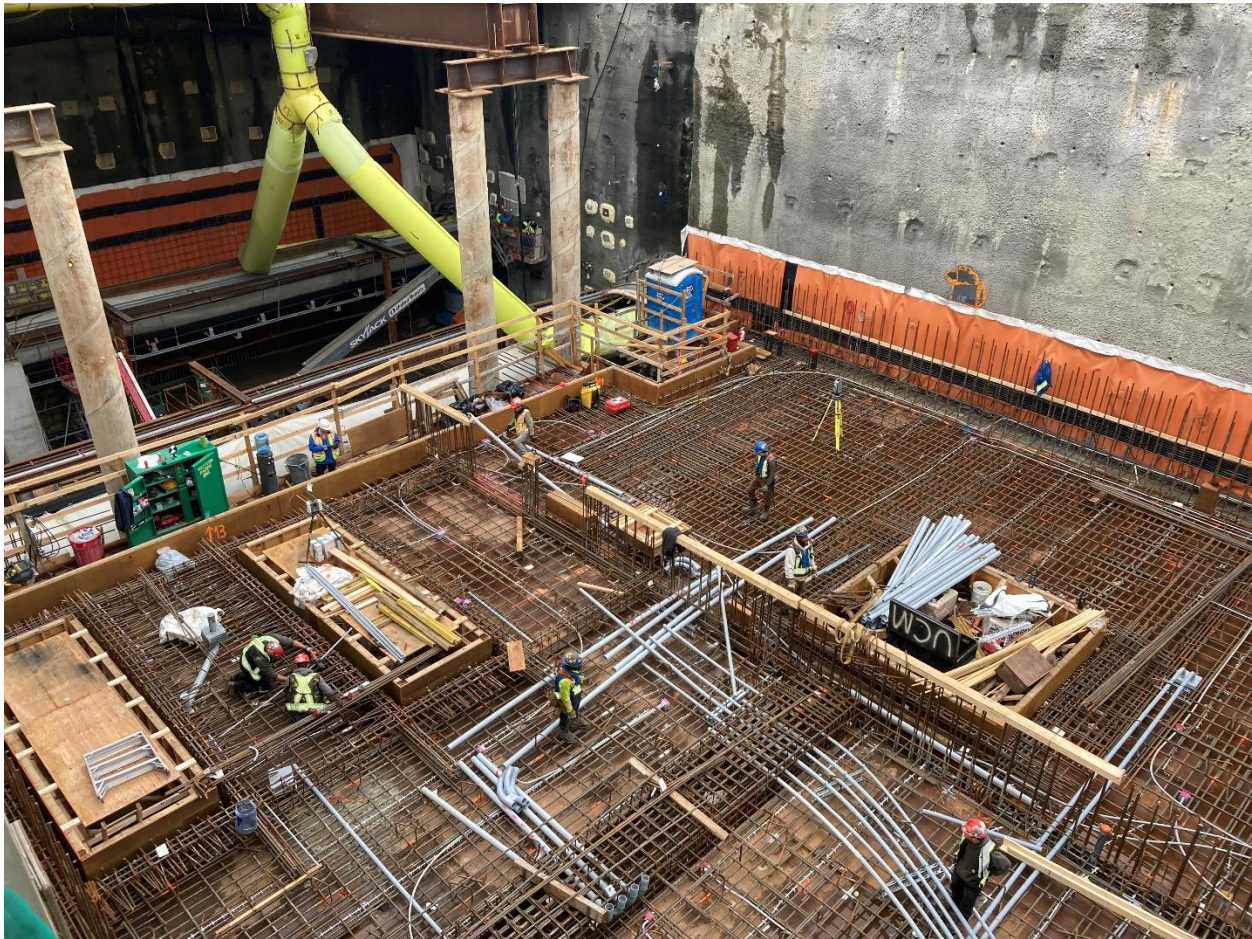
Mount Pleasant Station: Progressing with the layout of rebar and electrical conduit for the headhouse concourse slab.
